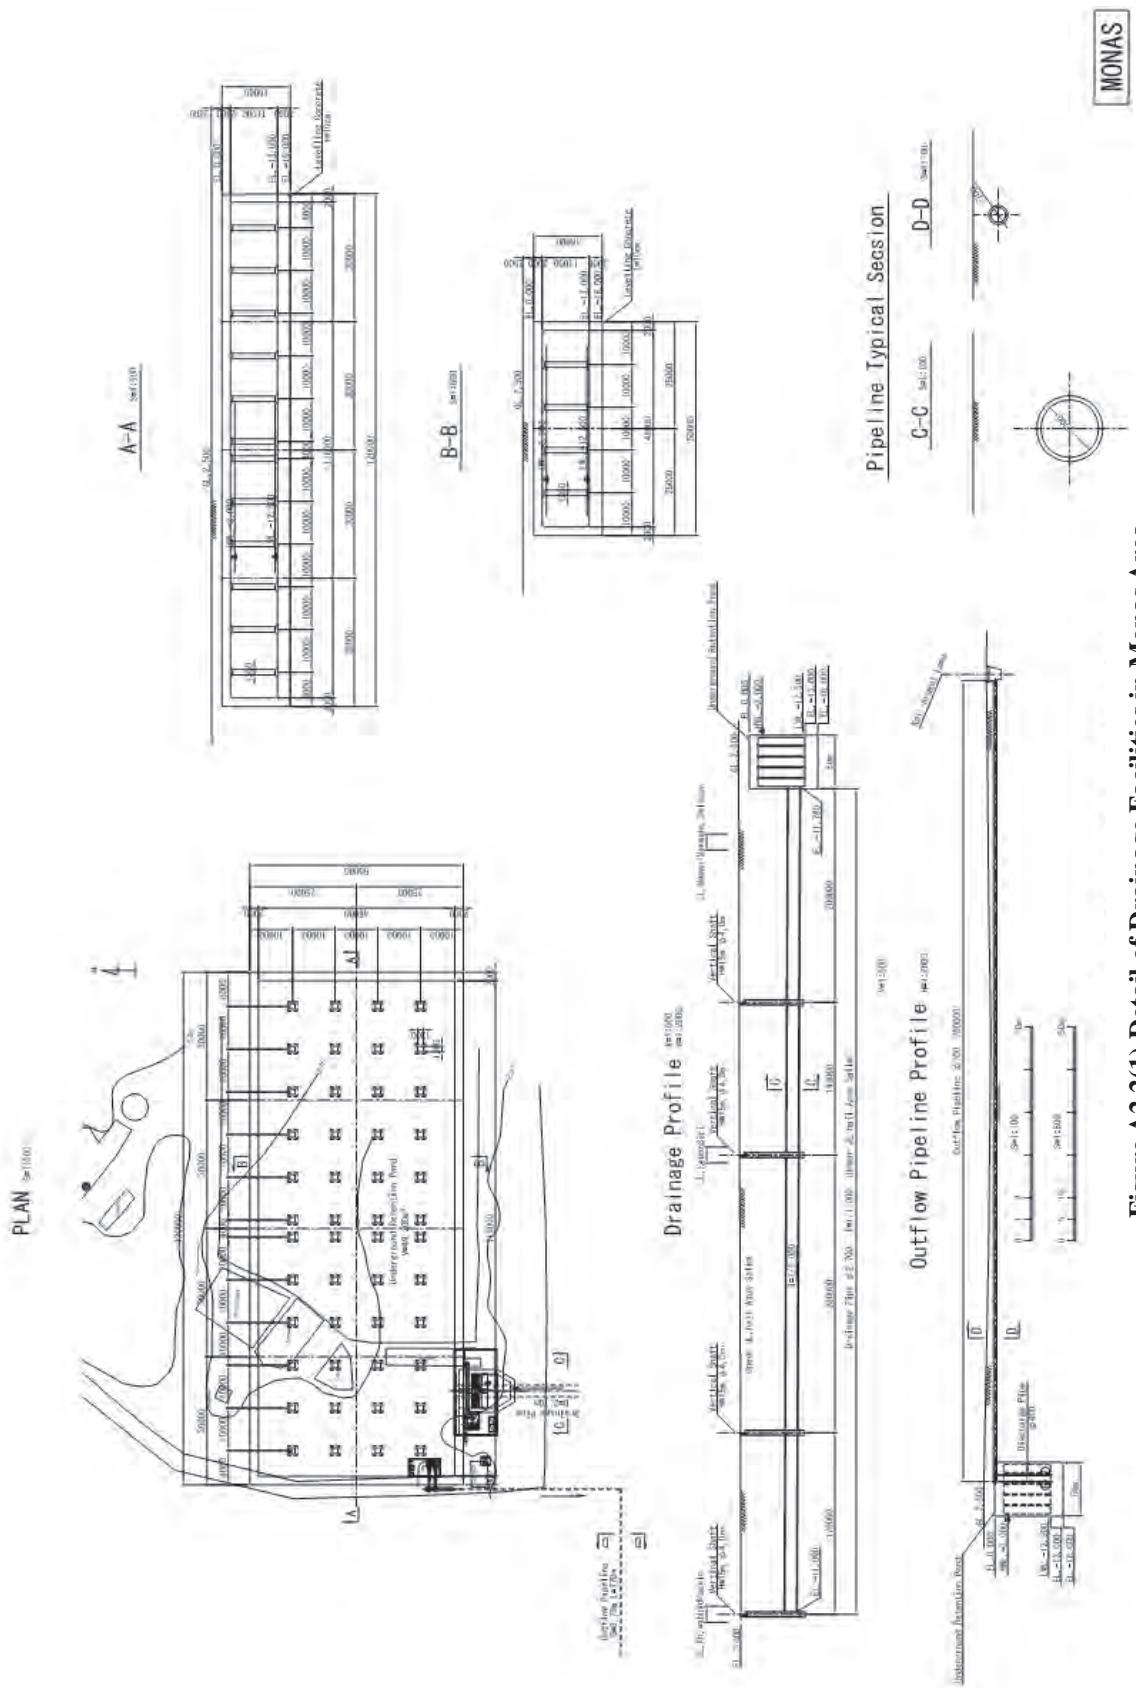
(1) Detail of Drainage Facilities in Monas Area
